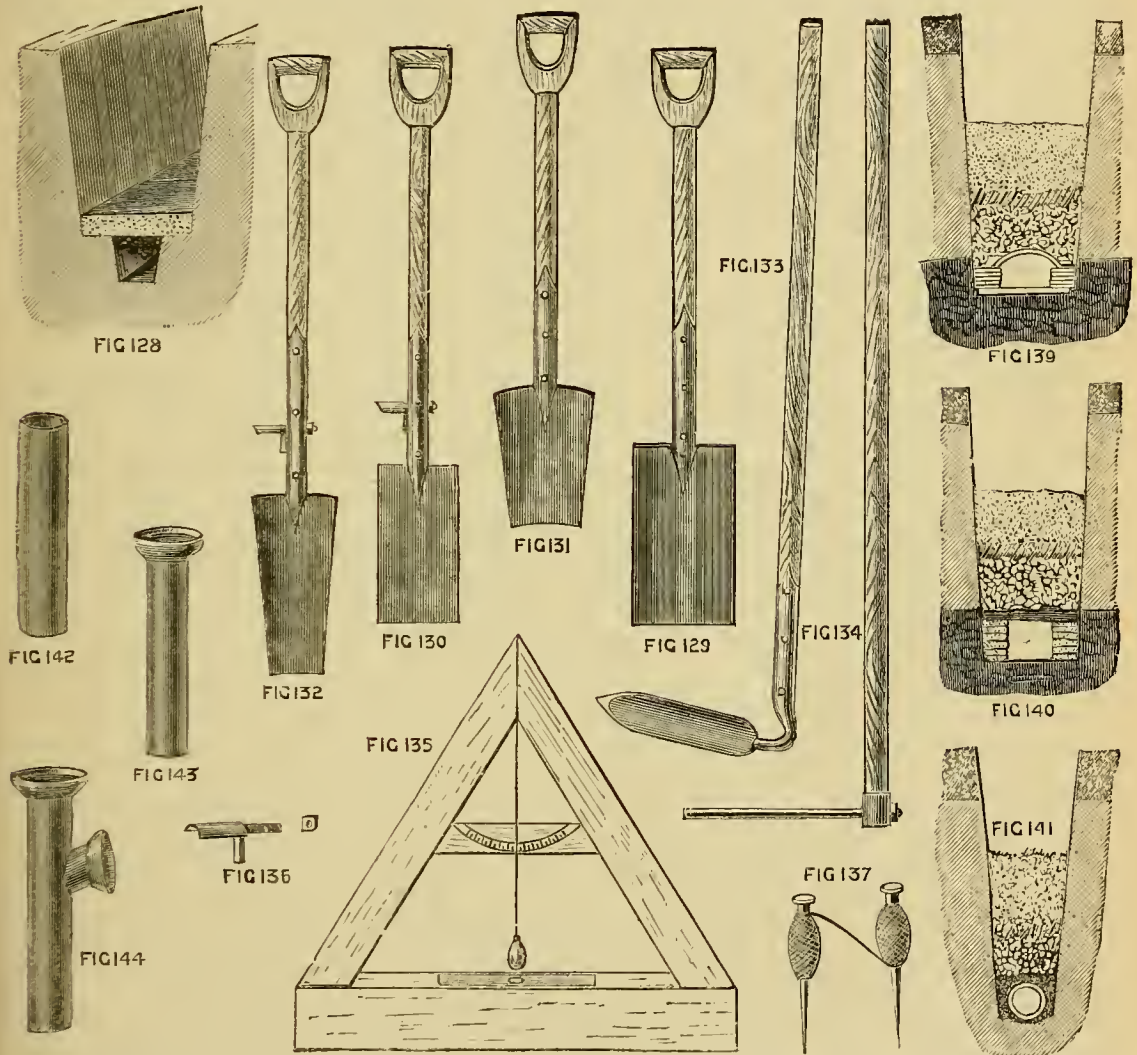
BOTTOM OF DRAIN IN PEAT AND CLAY. FIG. 129.—SPADE. FIG. 130.—GRAFTING TOOL. FIG. 131.—LONG-BLADED DRAINING TOOL. FIG. 132.—LONG-BLADED DRAINING TOOL. FIG. 133.—SWAN NECKED SCOOP. FIG. 134.—PIPE LAYER. FIG. 135.—COMBINED LEVEL, PLUMMET, AND SPIRIT LEVEL. FIG. 136.—IRON TREAD FOR DRAINING TOOLS. FIG. 137.—LINE ON IRON PINS. FIG. 139.—TILE DRAIN. FIG. 140.—STONE DRAIN. FIG. 141.—PIPE DRAIN. FIG. 142.—PLAIN DRAIN PIPE. FIG. 143.—SOCKETED DRAIN PIPE. FIG. 144.—JUNCTION SOCKET.
